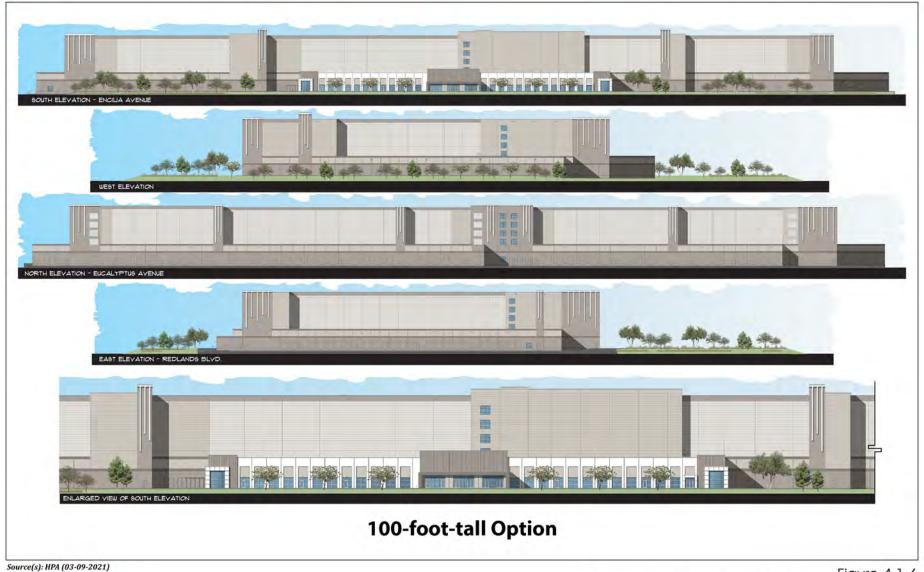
Conceptual Architectural Elevations for Fulfillment/E-Commerce Plan
